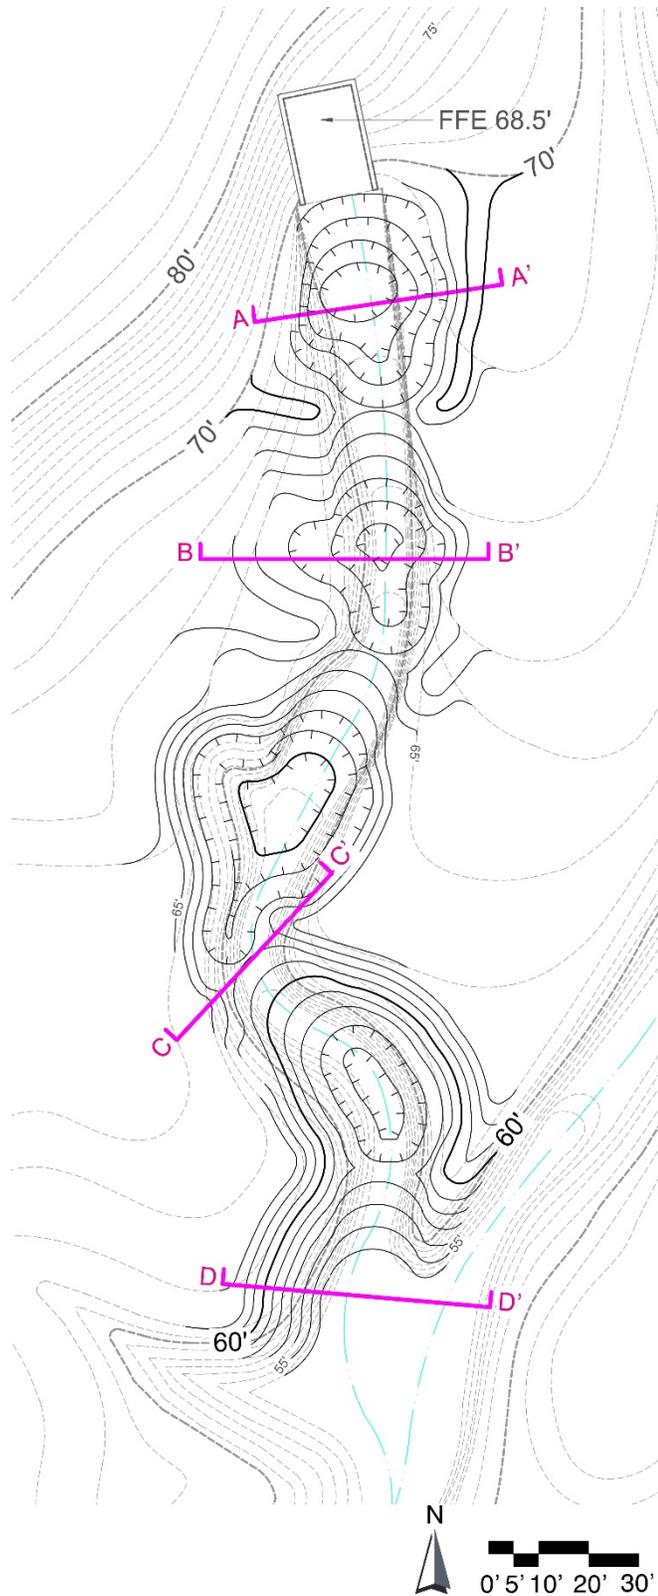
The one foot contour line topographic plan for the Parkdale High School RSC including section cut lines for the following sections
